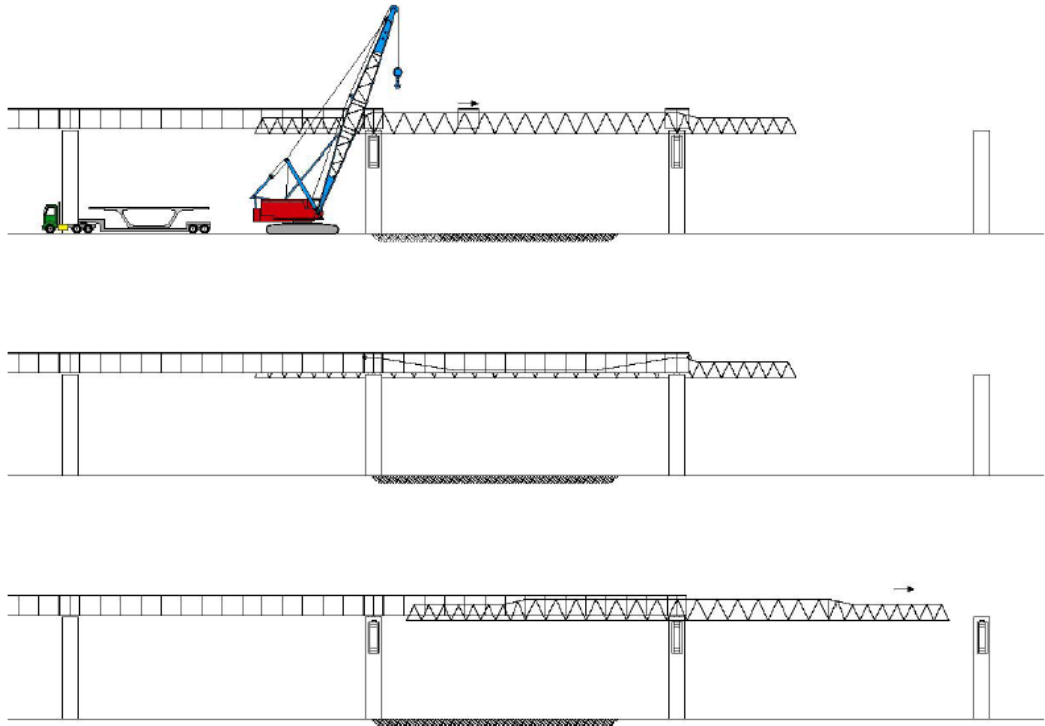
Span-by-Span Construction (with Erection Truss)
